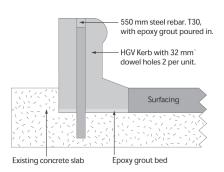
HGV Kerb: HGV with dowel bar – typical detail for use on bridge deck, etc.
